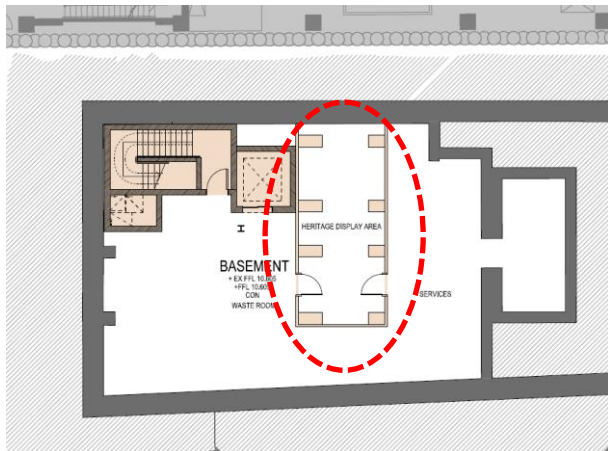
Extract of Basement Level Proposed Plan – heritage display area at base of silos circled
